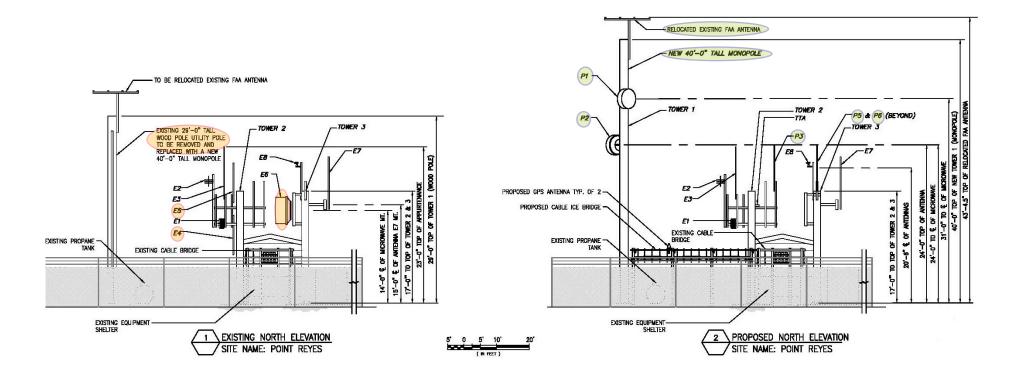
Site 8 - Point Reyes Hill Existing and Proposed Elevations
